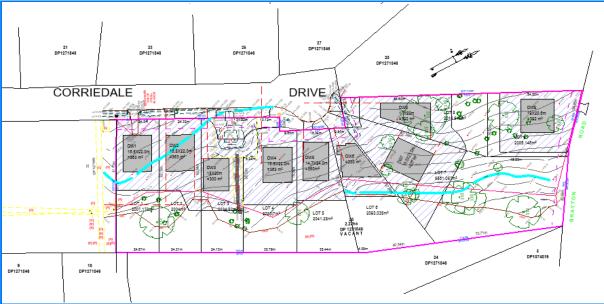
Proposed site/subdivision plan - No. 84 Corriedale Drive Marulan 2579.
